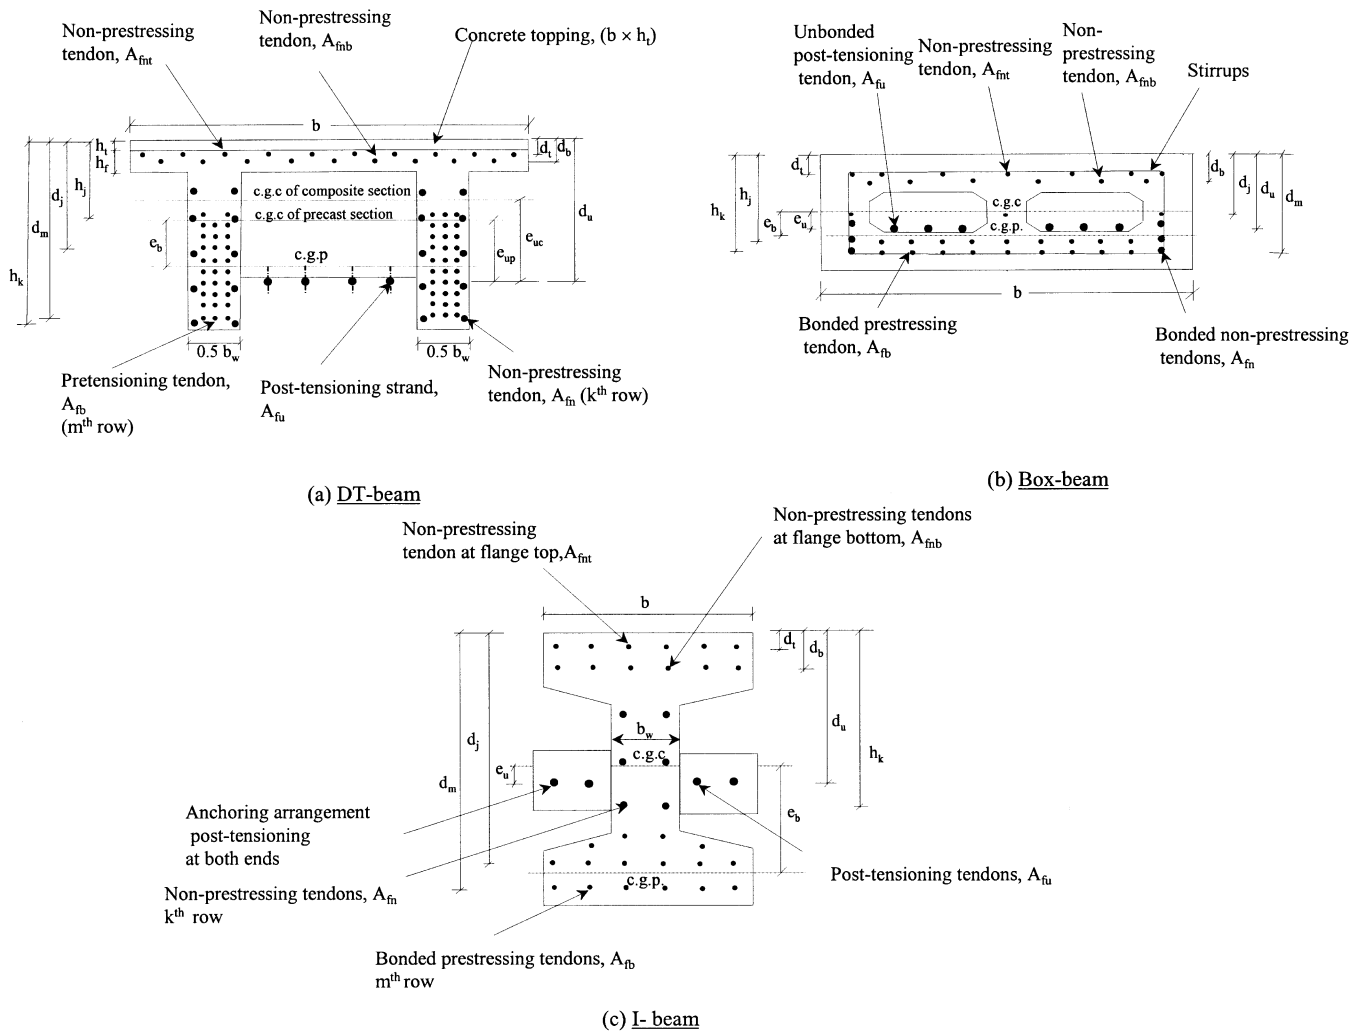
Typical cross sections for bridge beams with bonded and unbonded tendons.
